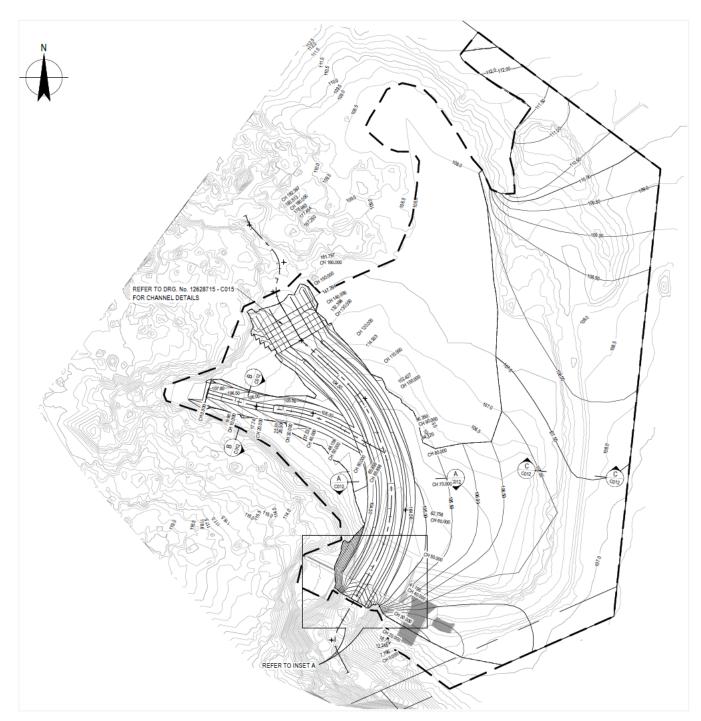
Indicative plan of civil earthworks (detailed design drawing 12628715-C010)
